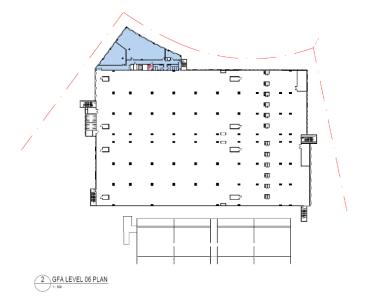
Proposed Level 6 plan extract(Source: Greenbox Architecture)
